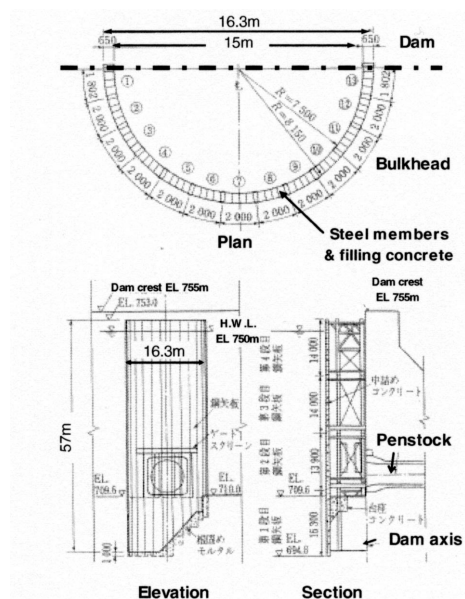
Bulkhead for the construction of intake, Okutadami extension HPP
